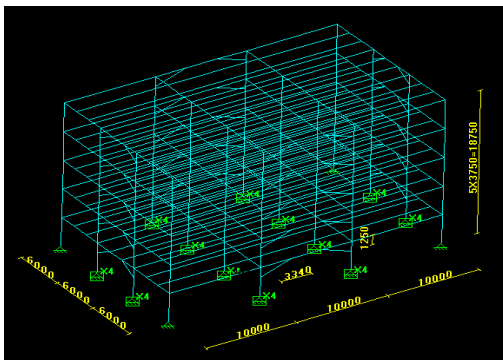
Shows typical floor plan and position of 16 columns represented by C1 to C16 and beams. All the column sections are made with encased steel concrete composite construction. The spacing between the columns are 6m in lateral direction [x direction] and 10m in longitudinal direction [y direction]. Beams are divided in to two categories as primary and secondary beams. Primary beams are directly rest on columns with restrained end conditions. Secondary beams are those which are connected to the primary beams by semi rigid connections. Secondary beams are provided with stud type shear connectors to facilitate composite action by floor slab.
